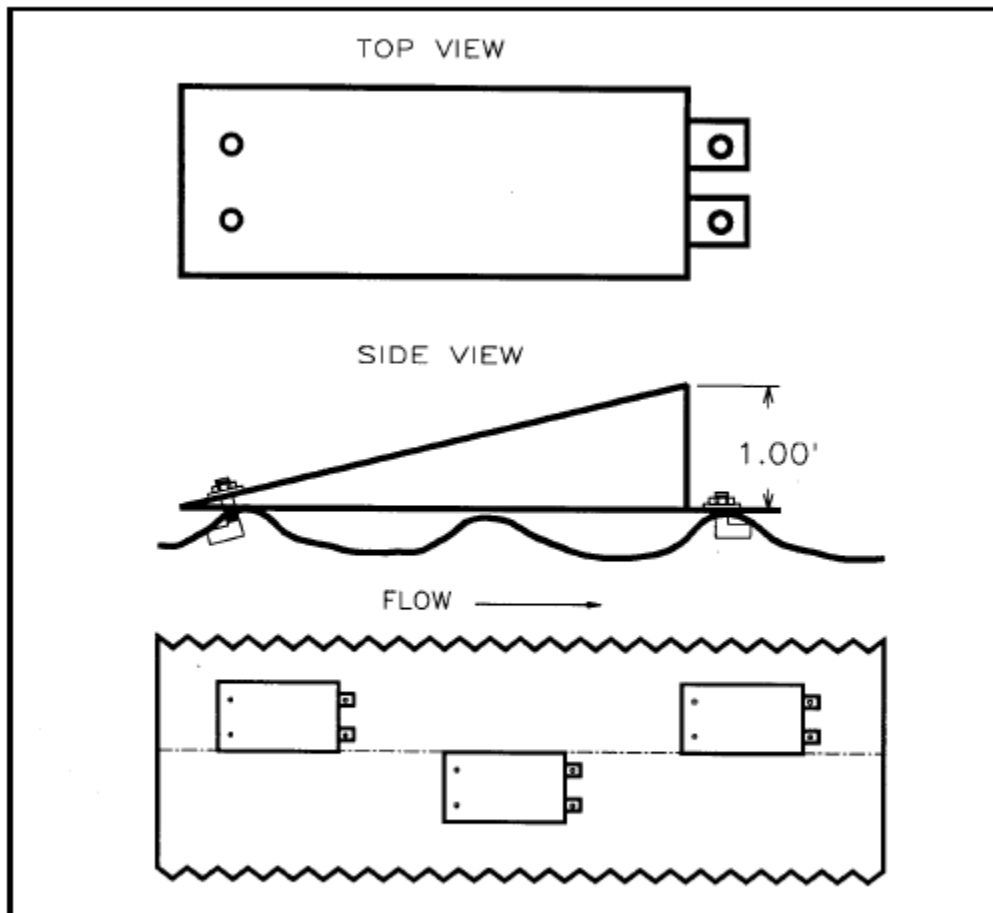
Corrugated metal pipe steel ramp baffles.
